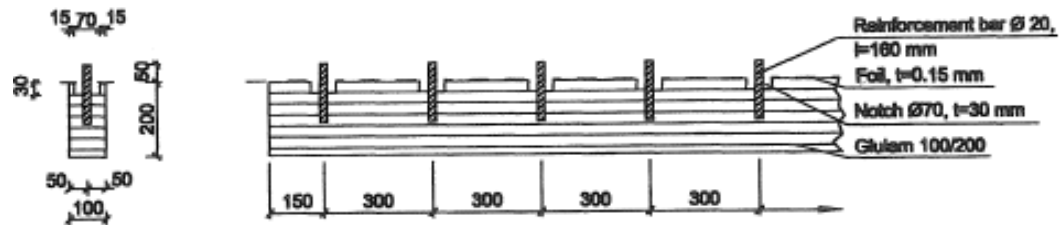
Timber-concrete connection with grooved holes and dowels (Linden, 1999) (dimensions in mm)
